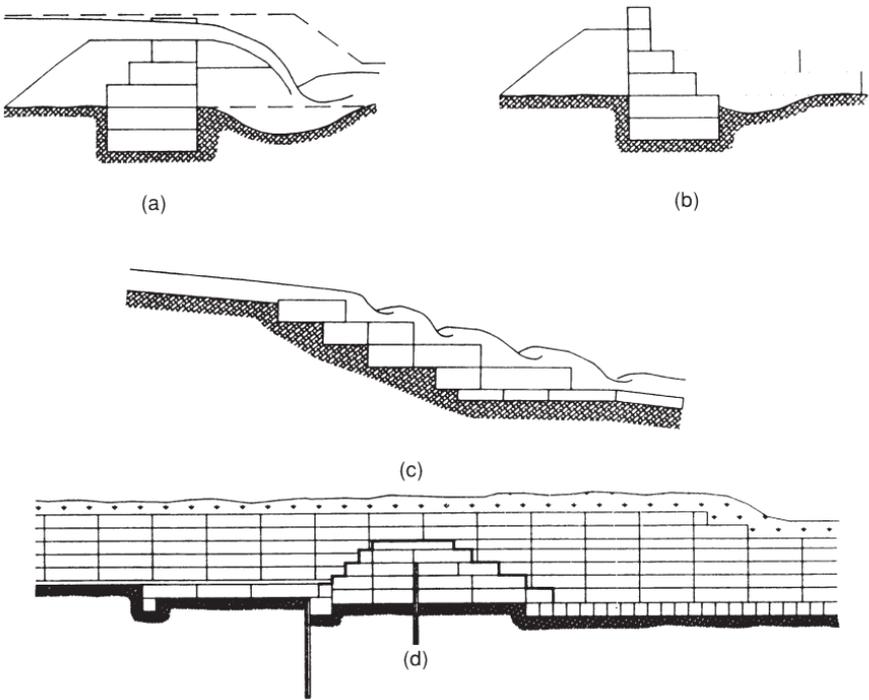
Typical gabion weir cross sections: a) vertical face; b) stepped face; c) long stepped; and d) sloped.
